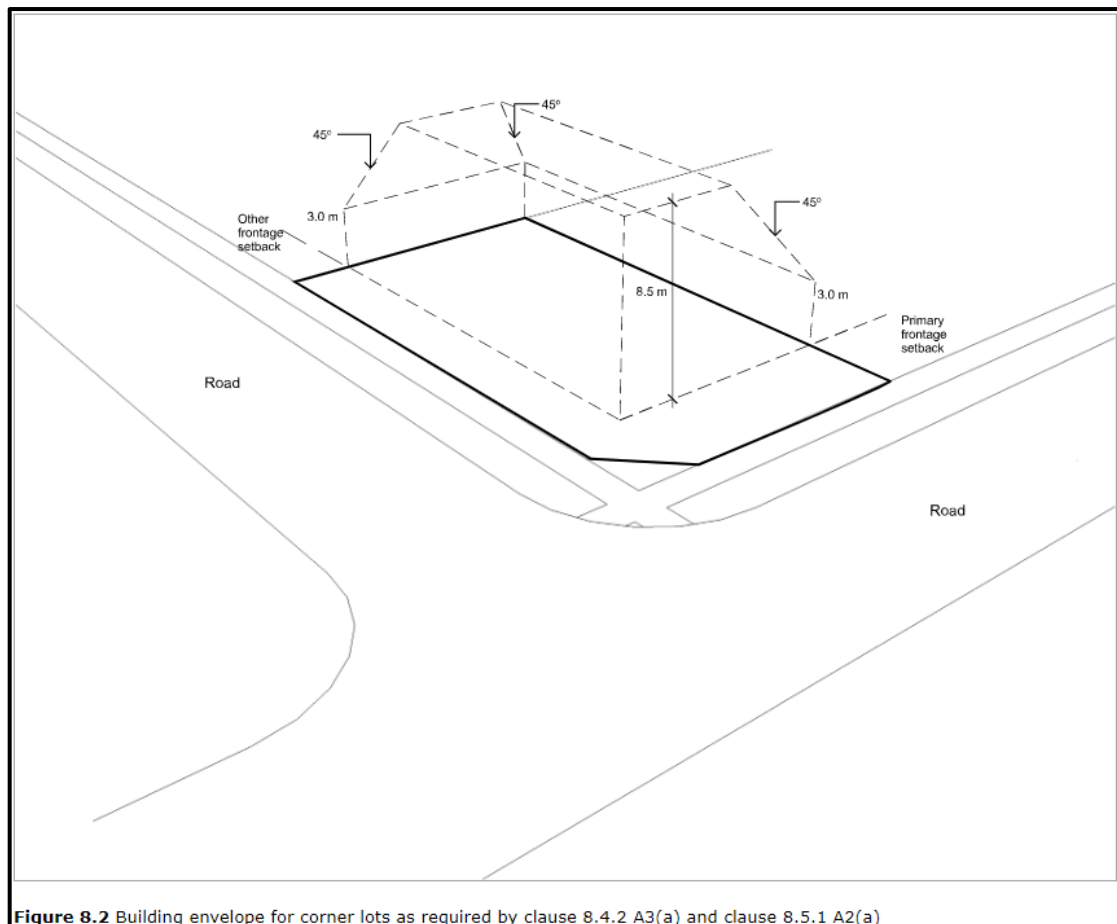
Building envelope for corner lots as required by clause 8.4.2 A3(a) and clause 8.5.1 A2(a)
